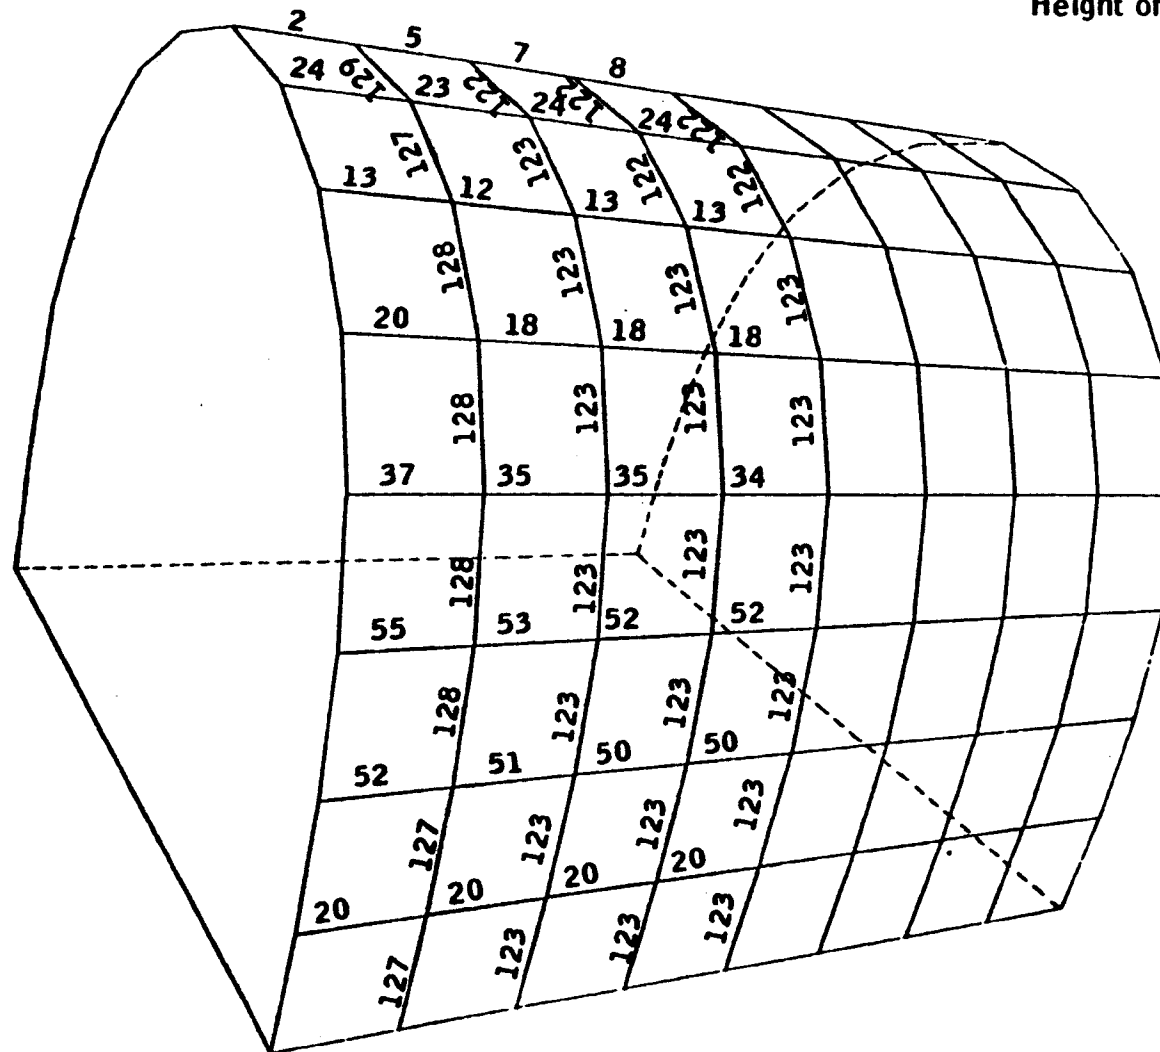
a2 - Tension forces in the cables (in kN)
